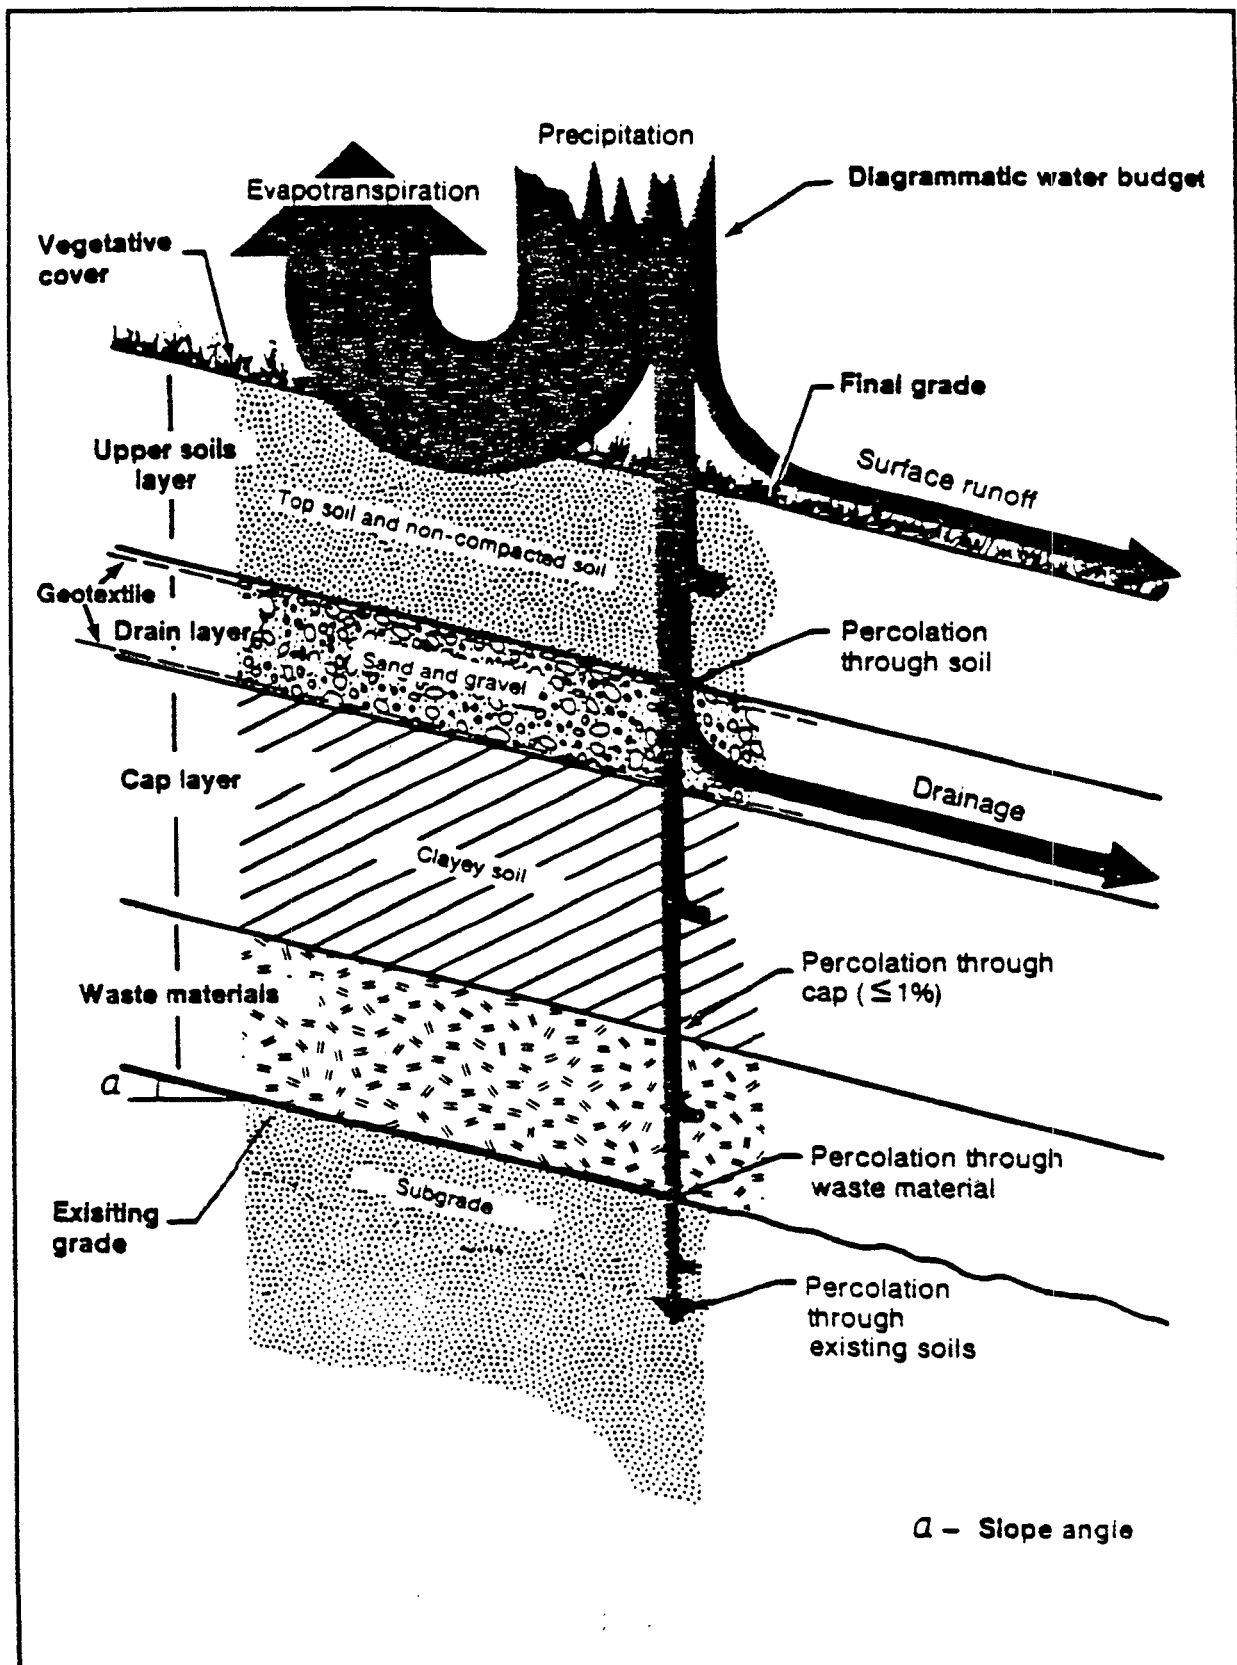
TYPICAL MULTILAYER CAP SYSTEM PROFILE
